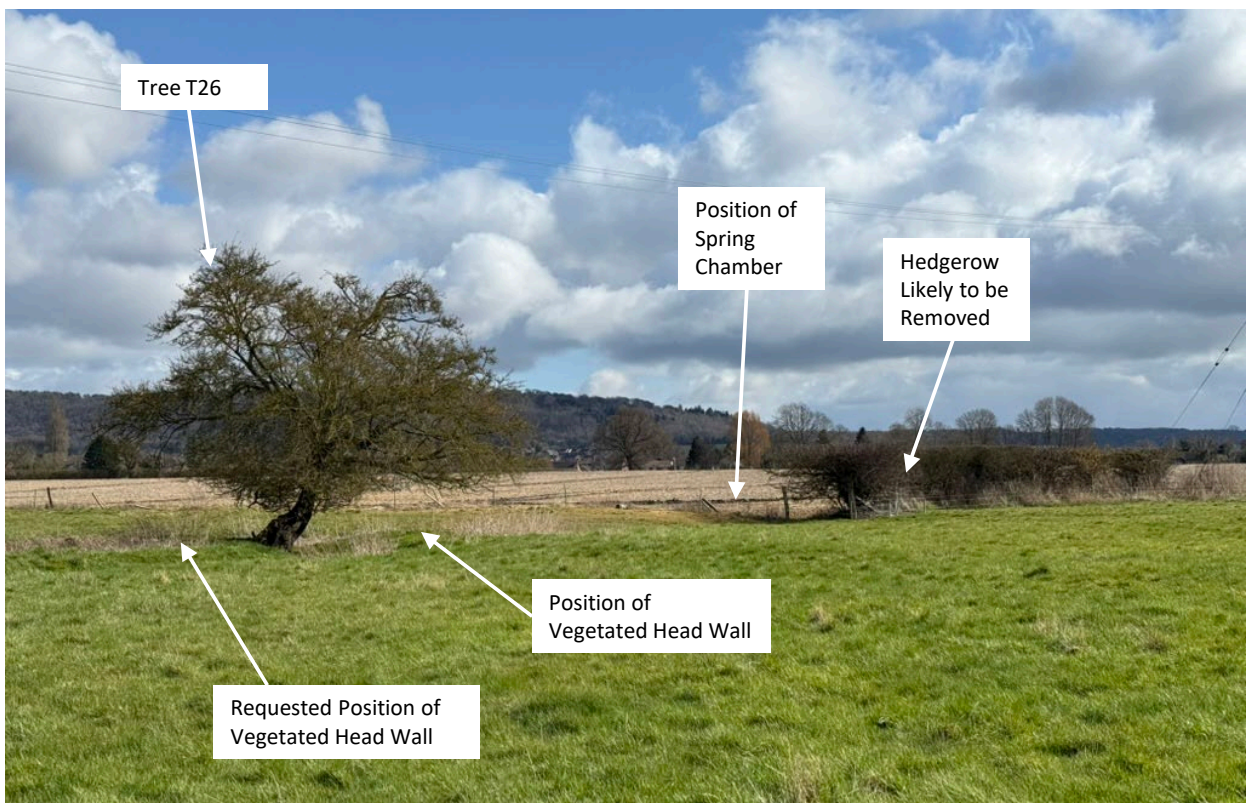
Spring Chamber site between Tree 26 and hedgerow (both affected by the construction)
